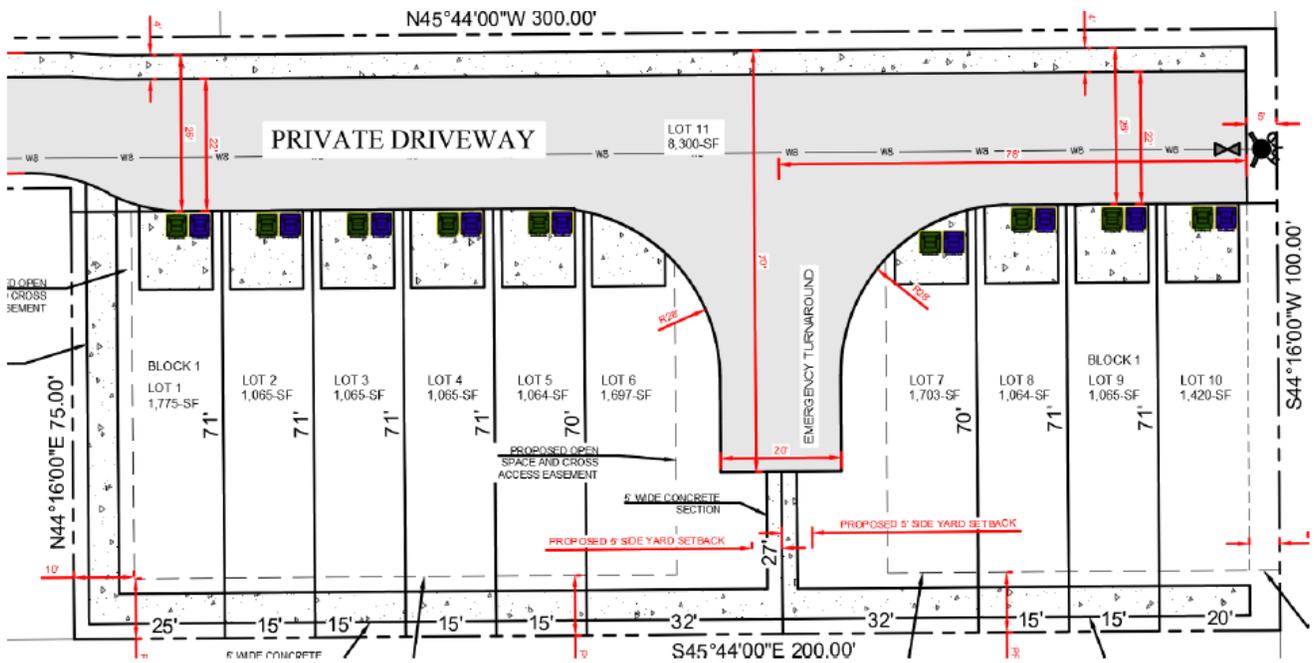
Old site plan, however it shows what trash services will look like within the development.
